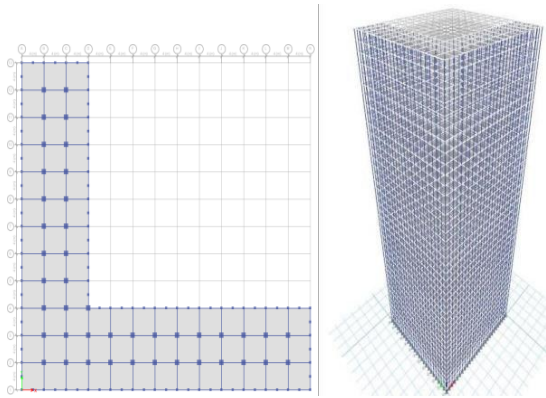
Plan view and 3-Dimensional view of L-Shape model
